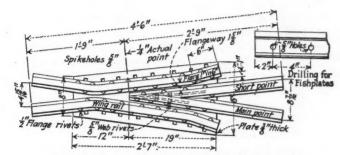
No. 4 STIFF FROG FOR 20-LB. RAILS RAIL—2§-in. 20-lb. A.S.C.E. section, first quality. Drilled 2 in. x 4 in. — §-in. holes. Flange Rivers—§-in. diameter. 43 total, to be spaced about as shown. To be countersunk on bottom, flush with plate.
